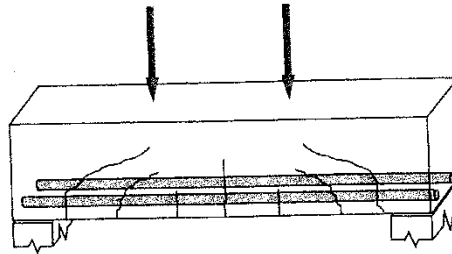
Shear cracks in beam with longitudinal reinforcement
